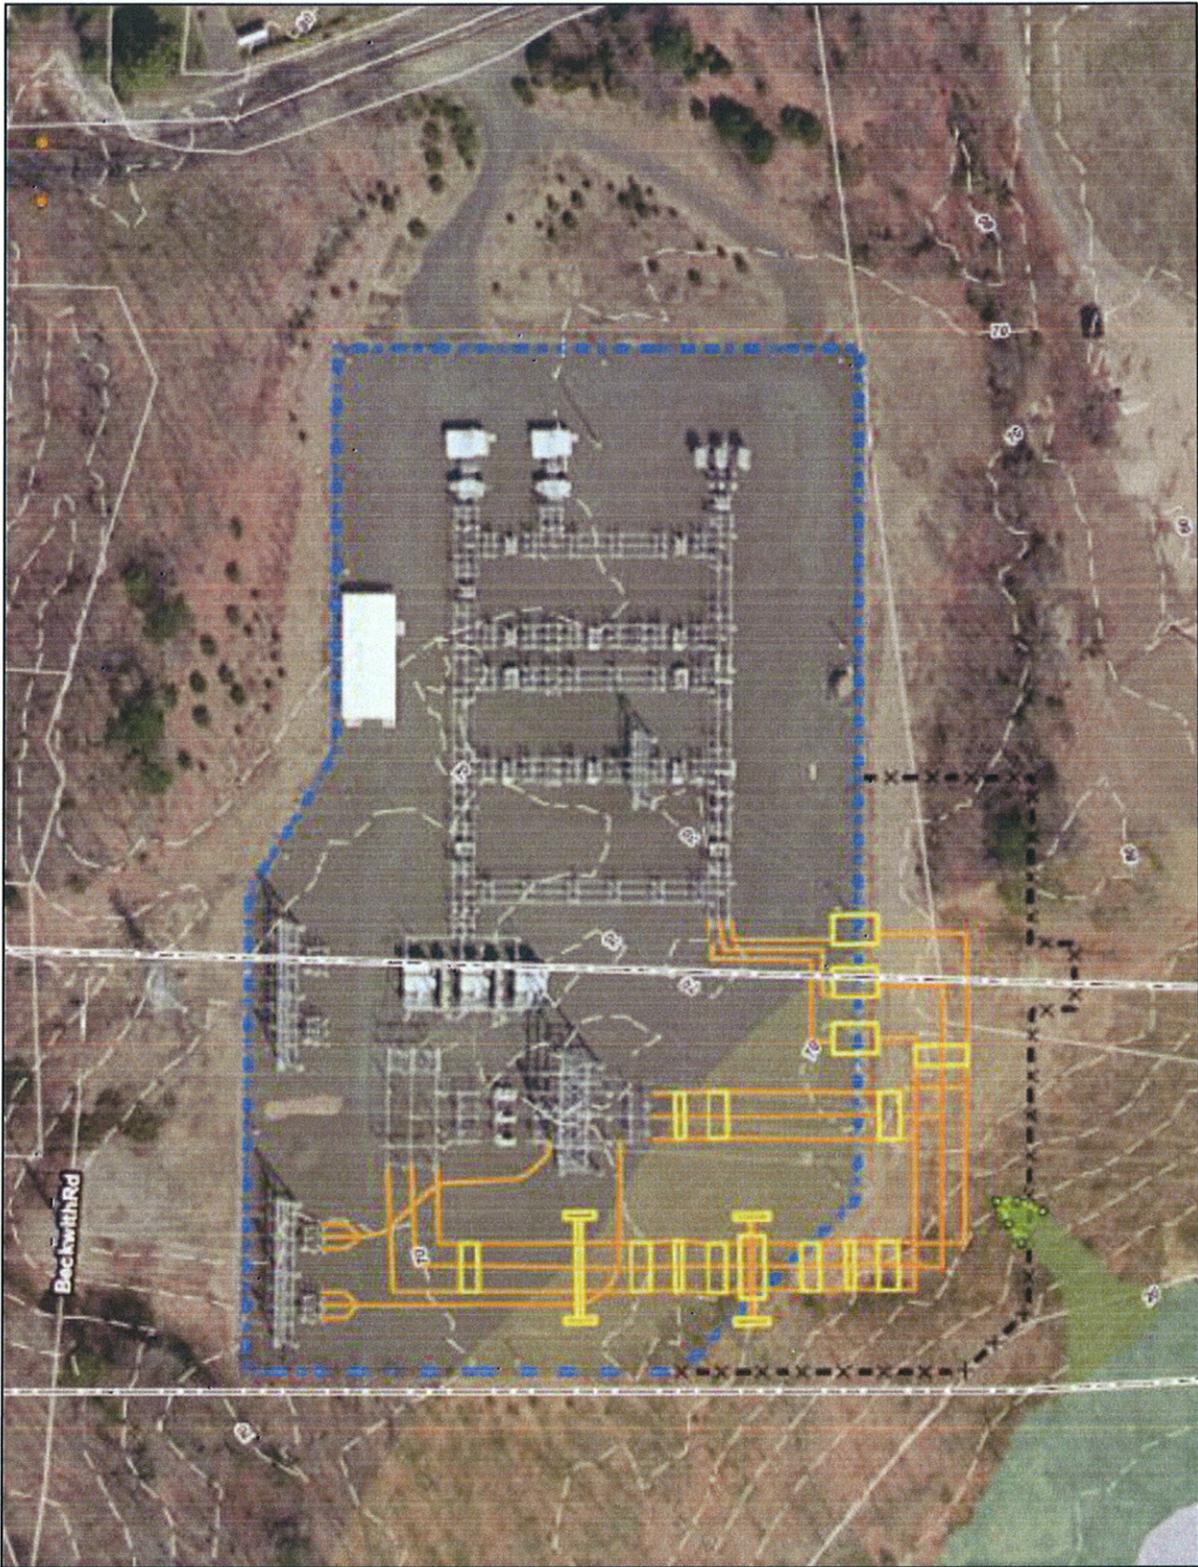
Plan view depicting the proposed substation upgrade project location in Haddam, Connecticut.
